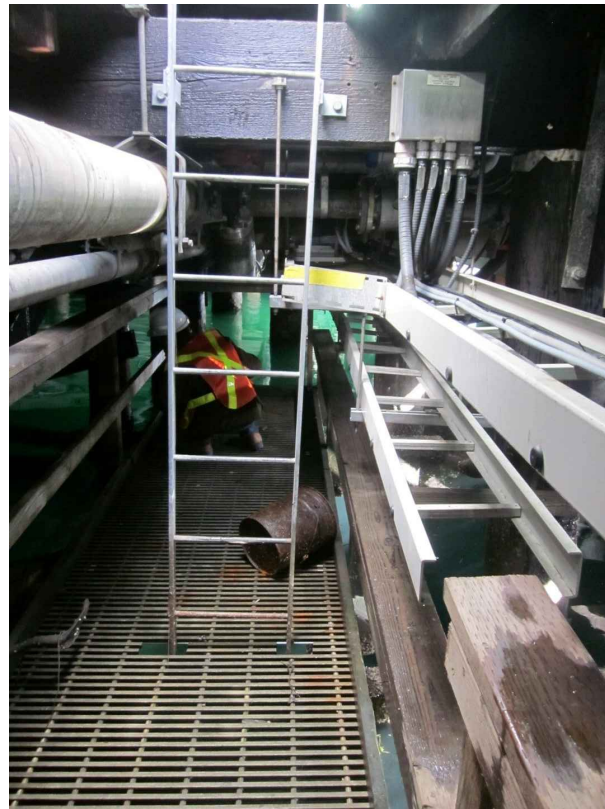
SOUTH JETTY CATWALK LADDER ACCESS AND CABLING LAYOUT
